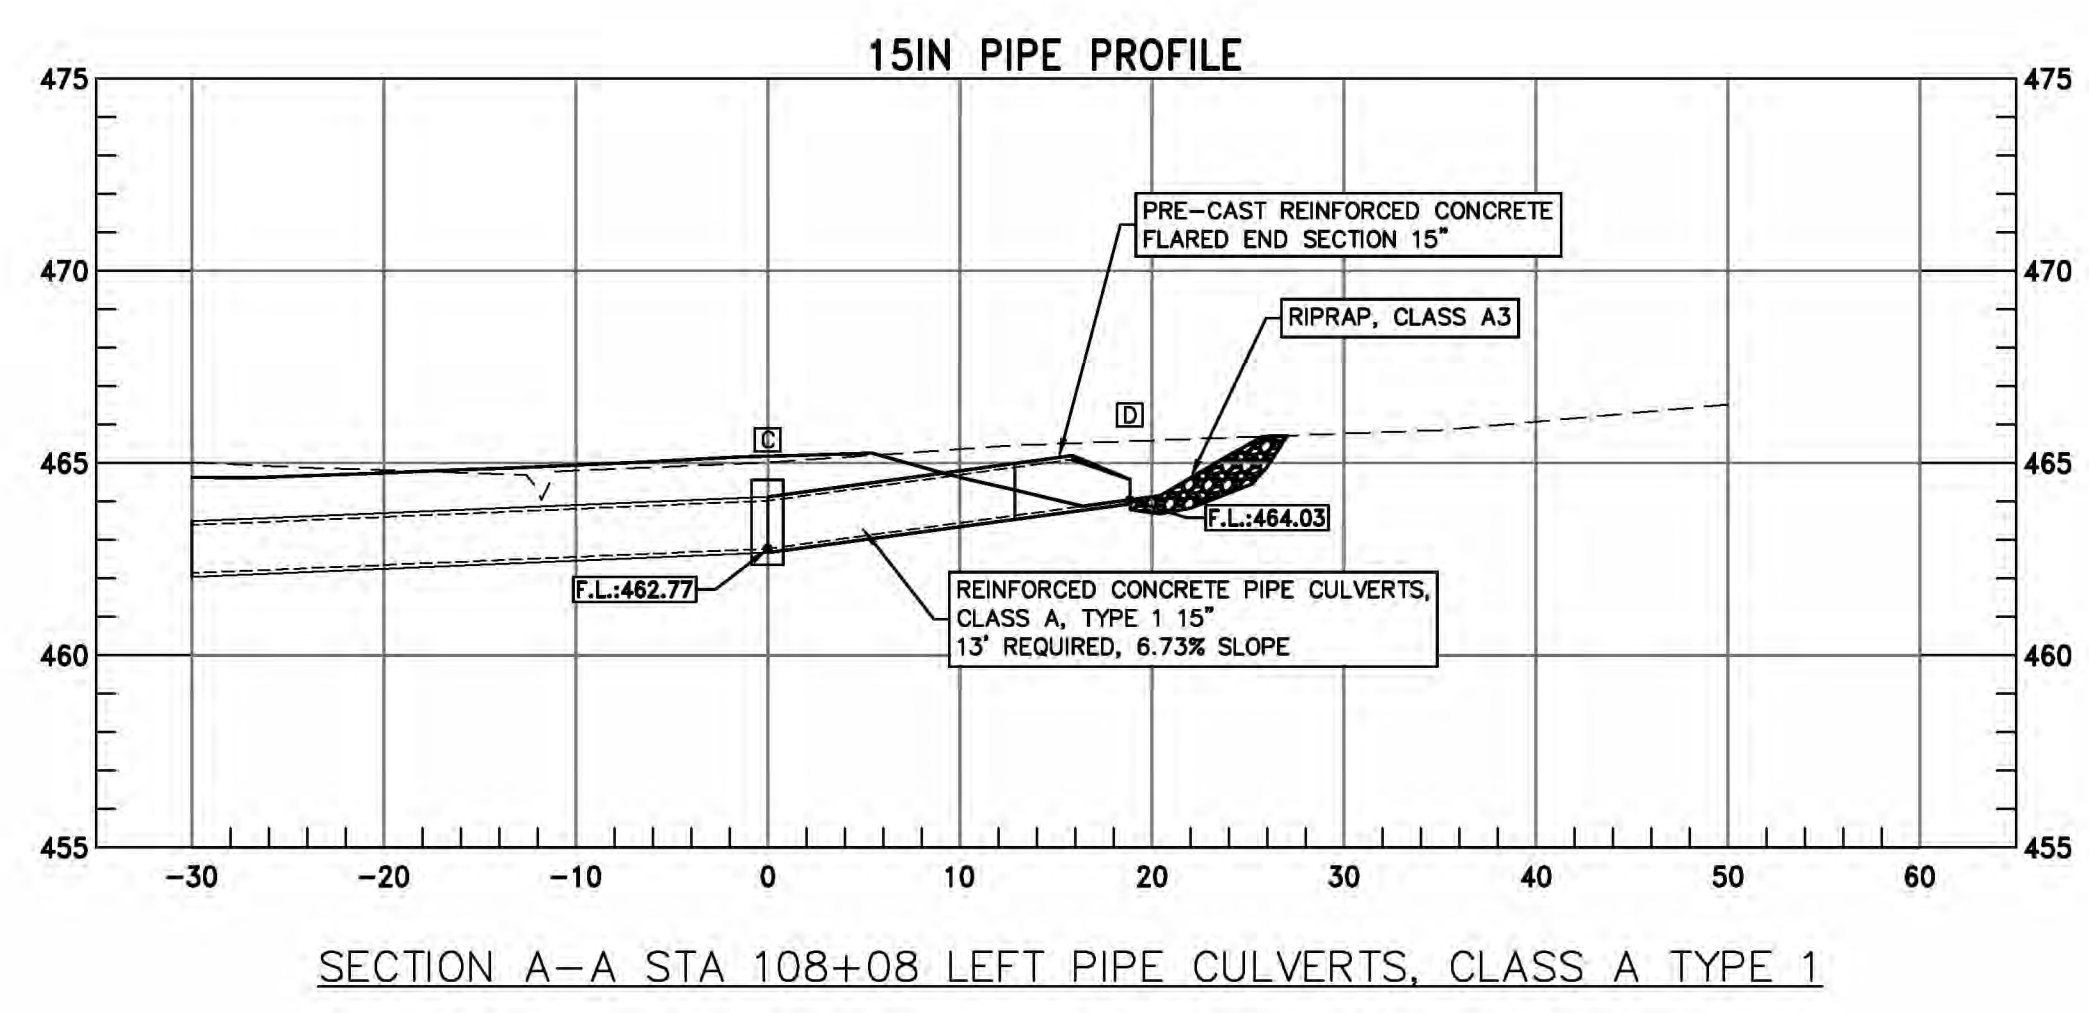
DETAIL OF RIPRAP AREAS AT STA. 108+08 LEFT
